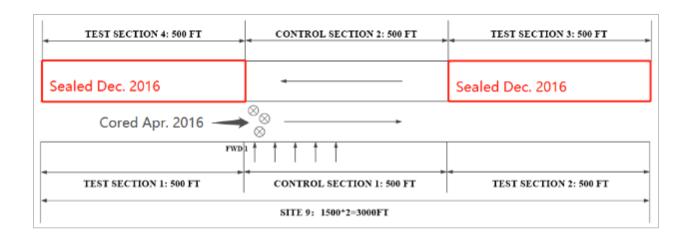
Graph. Sealed Sections and First Coring Locations at Site 9
